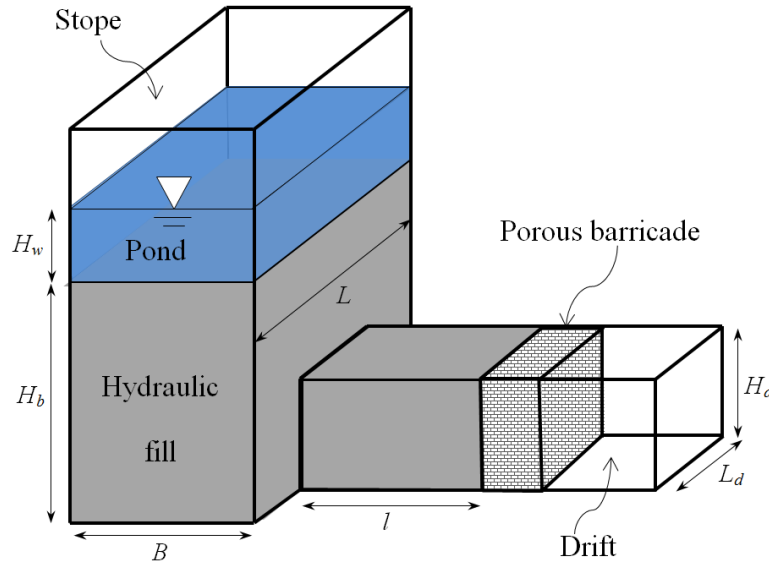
Schematic model of a typical backfilled stope with a pond above the fill surface
